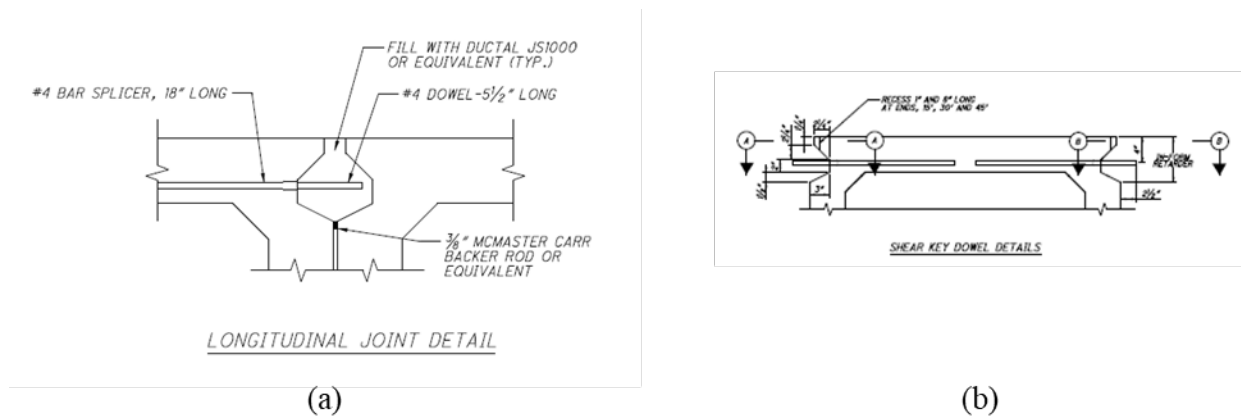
(a) Longitudinal joint detail and (b) shear key dowel detail [29]
